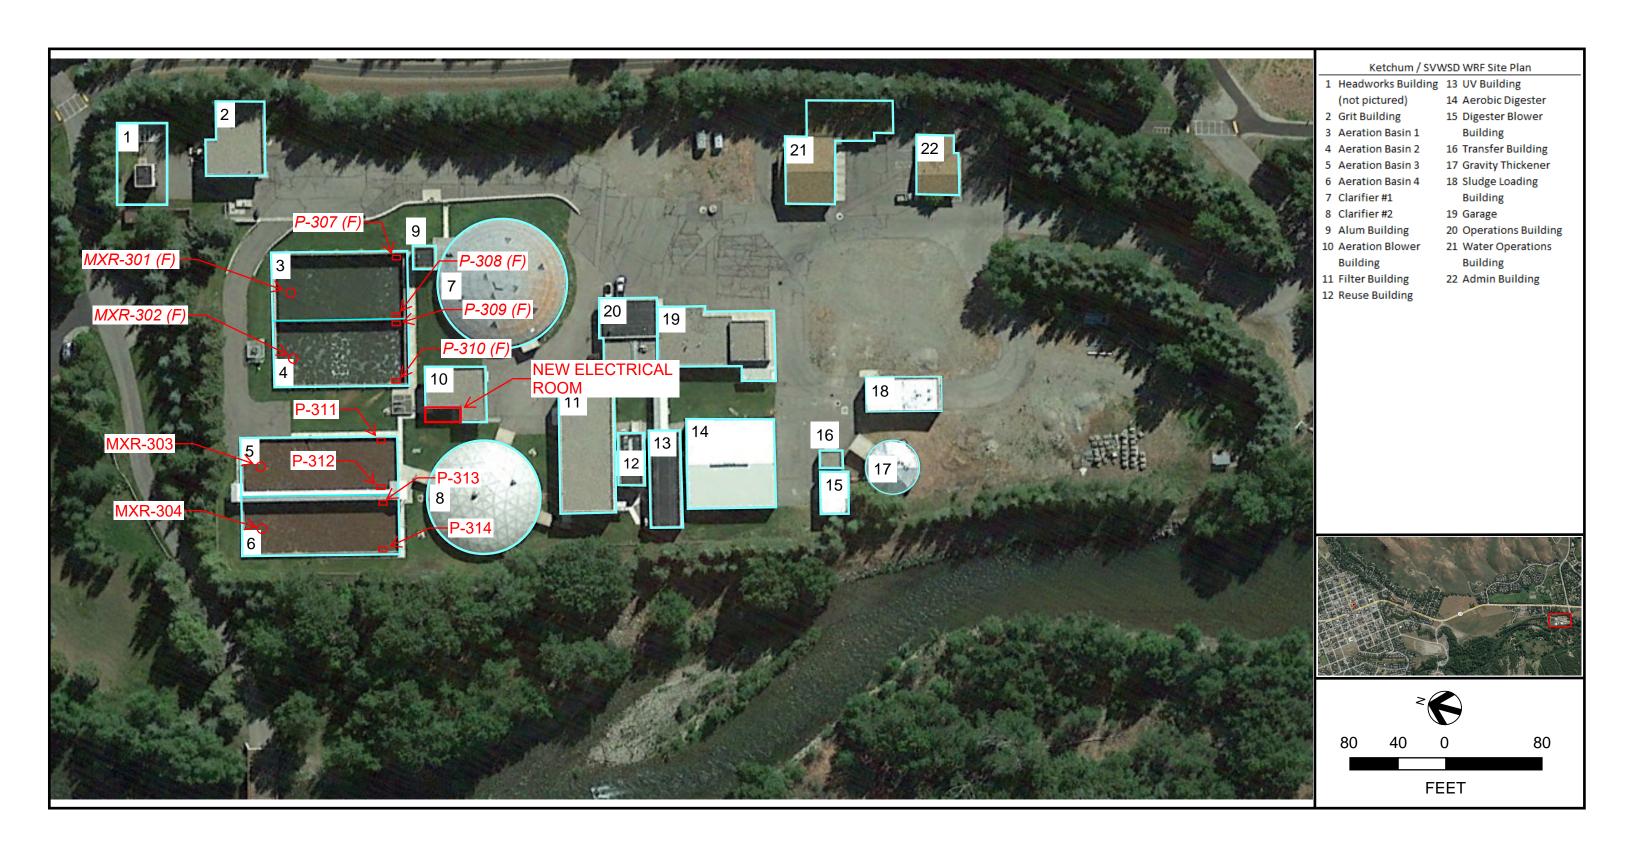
SITE PLAN FOR MLE CONVERSION MODIFICATIONS
